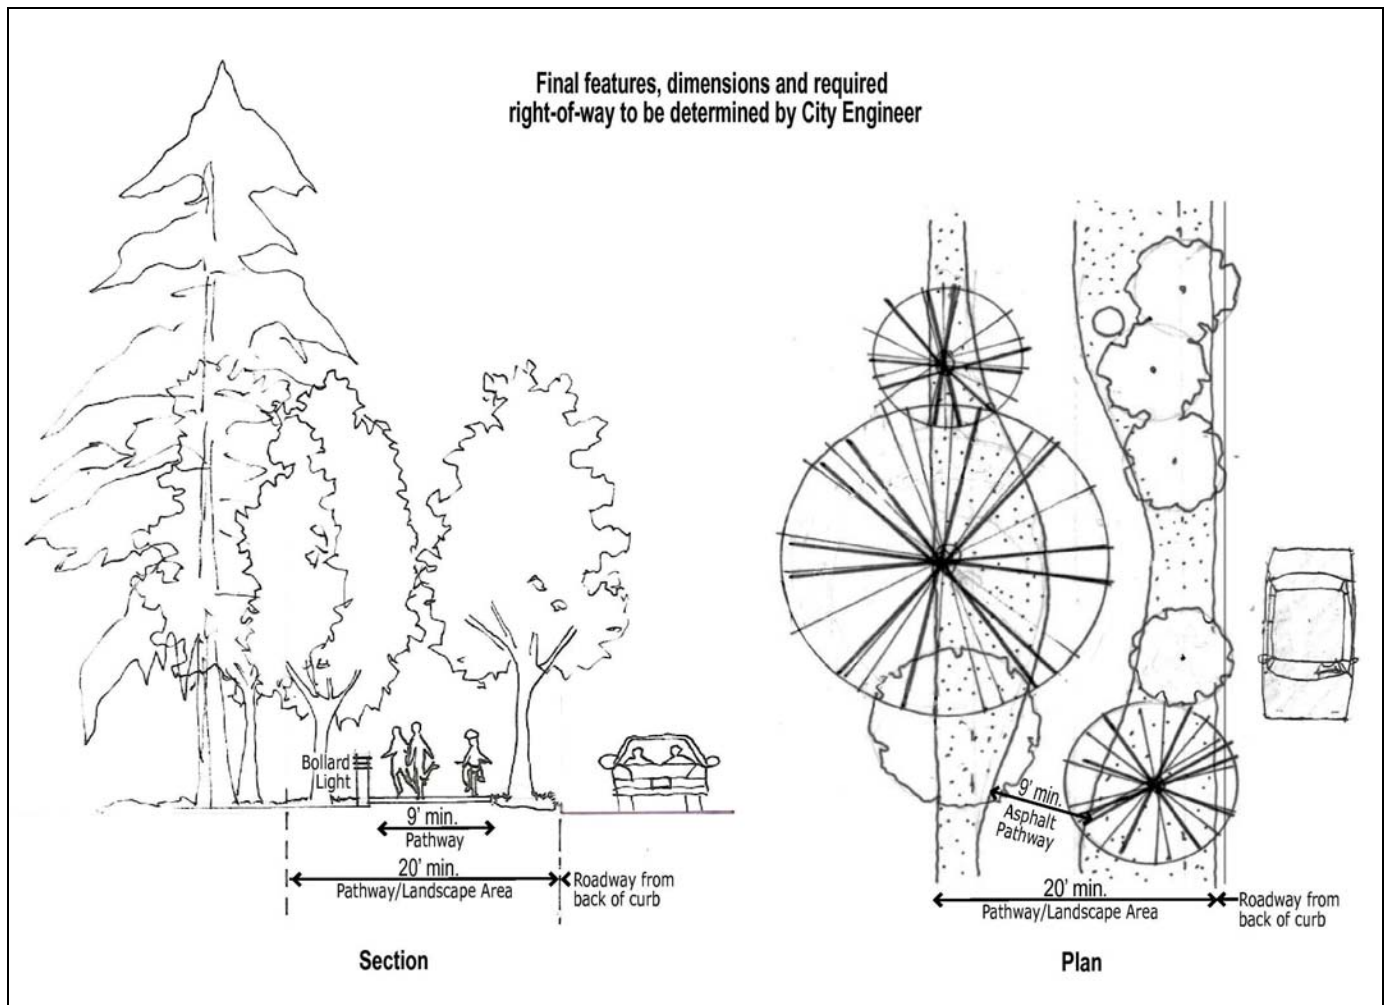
HH: Crossroads Gateway Streetscape
